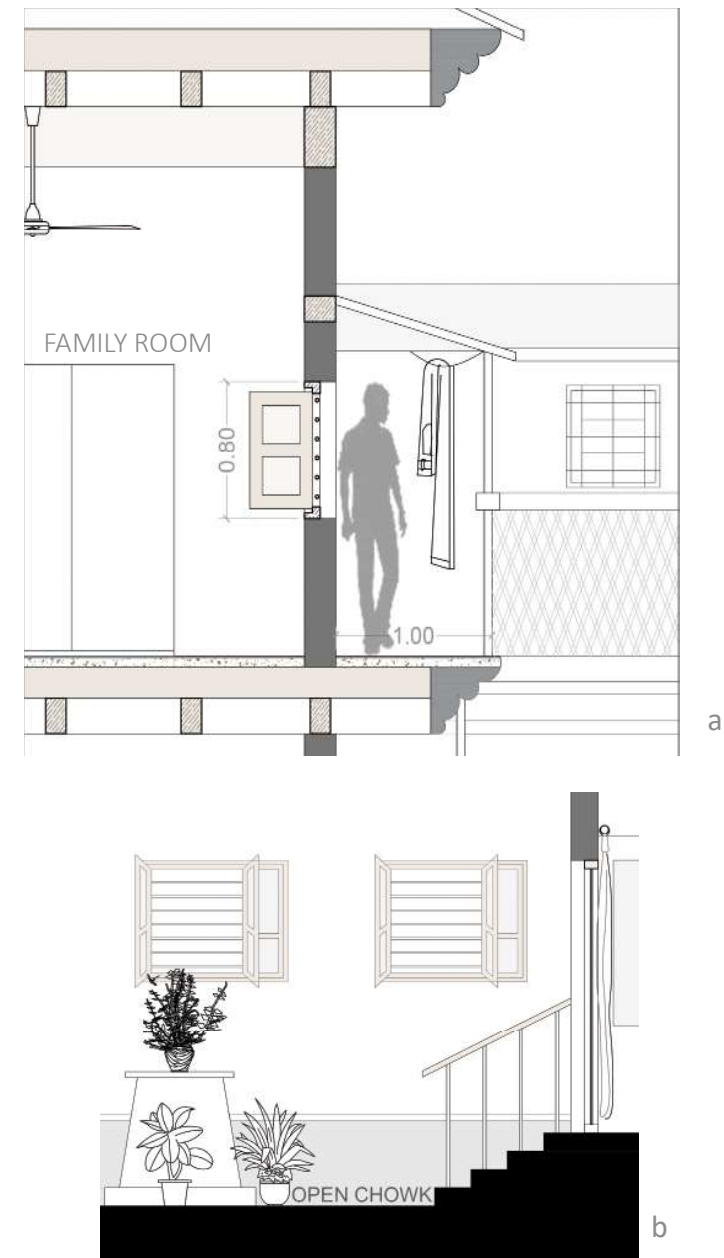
(a). Small Window - Section through family room (1st floor)
